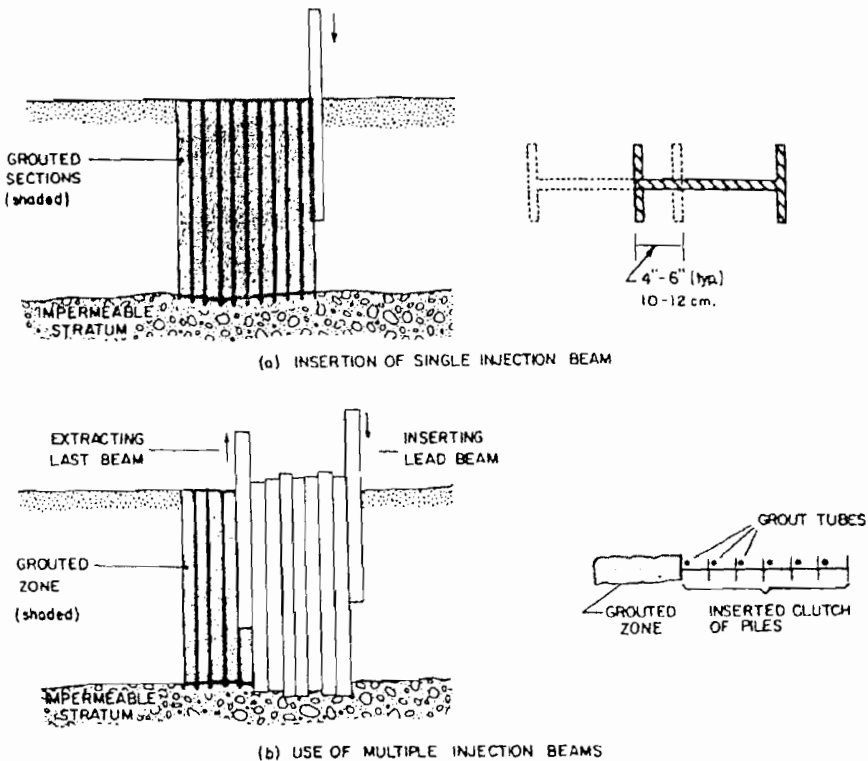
Injection Beam Grouting (Guertin, 1982)
